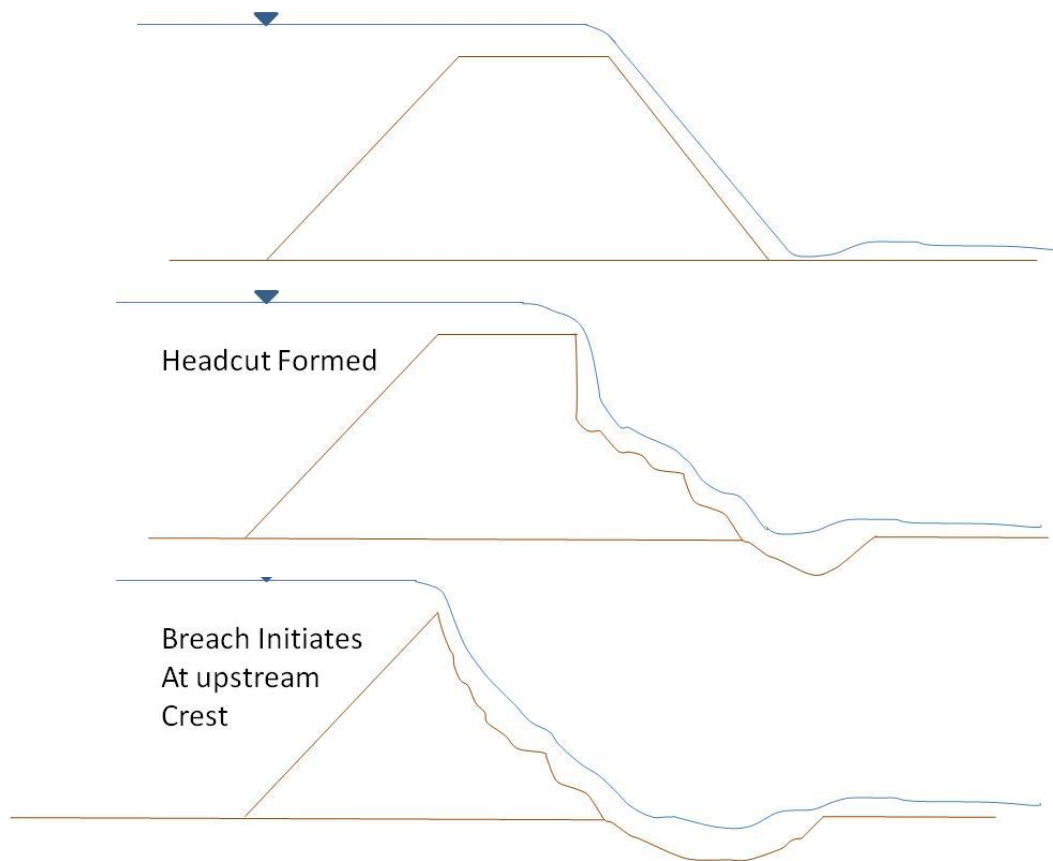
Dam Overtopping Failure Progression for Embankment Dam
